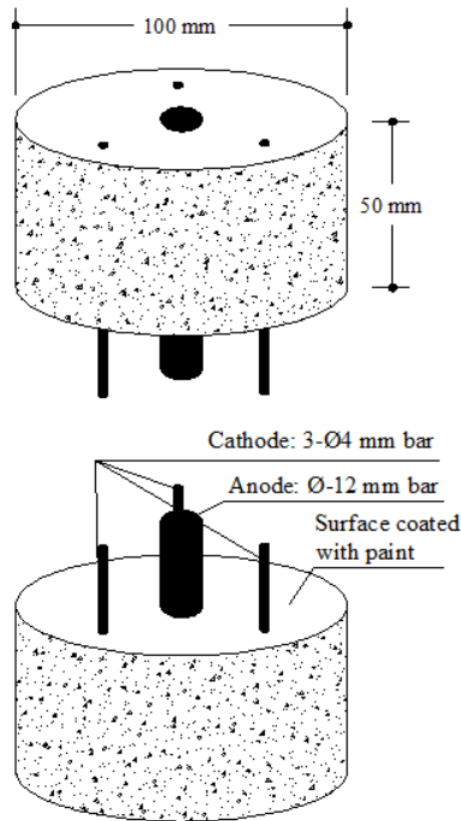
Details of Cylindrical Plates (a) Top View (b) Bottom View
